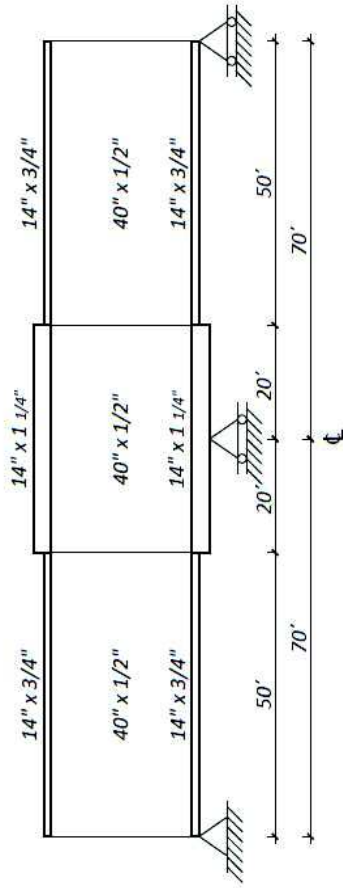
Sketch of the typical 70'-70' two-span composite steel I-girder bridge
